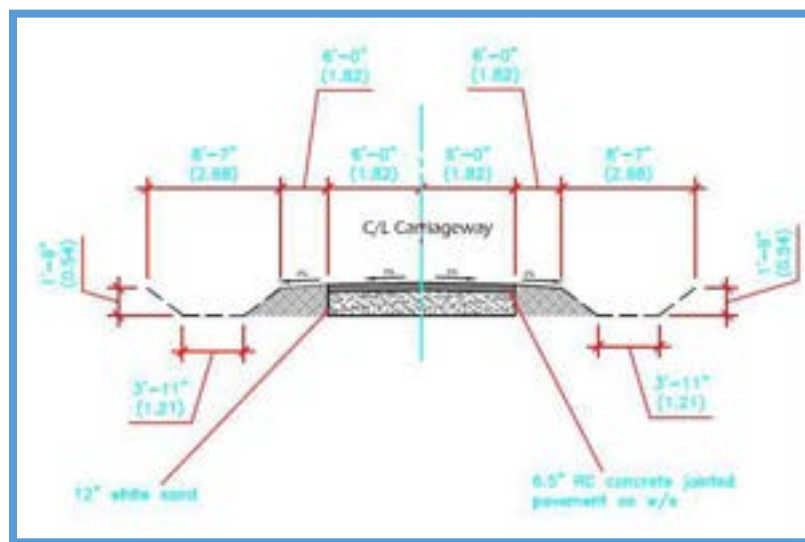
Jointed Reinforced Concrete Pavement on White Sand Secondary Road
